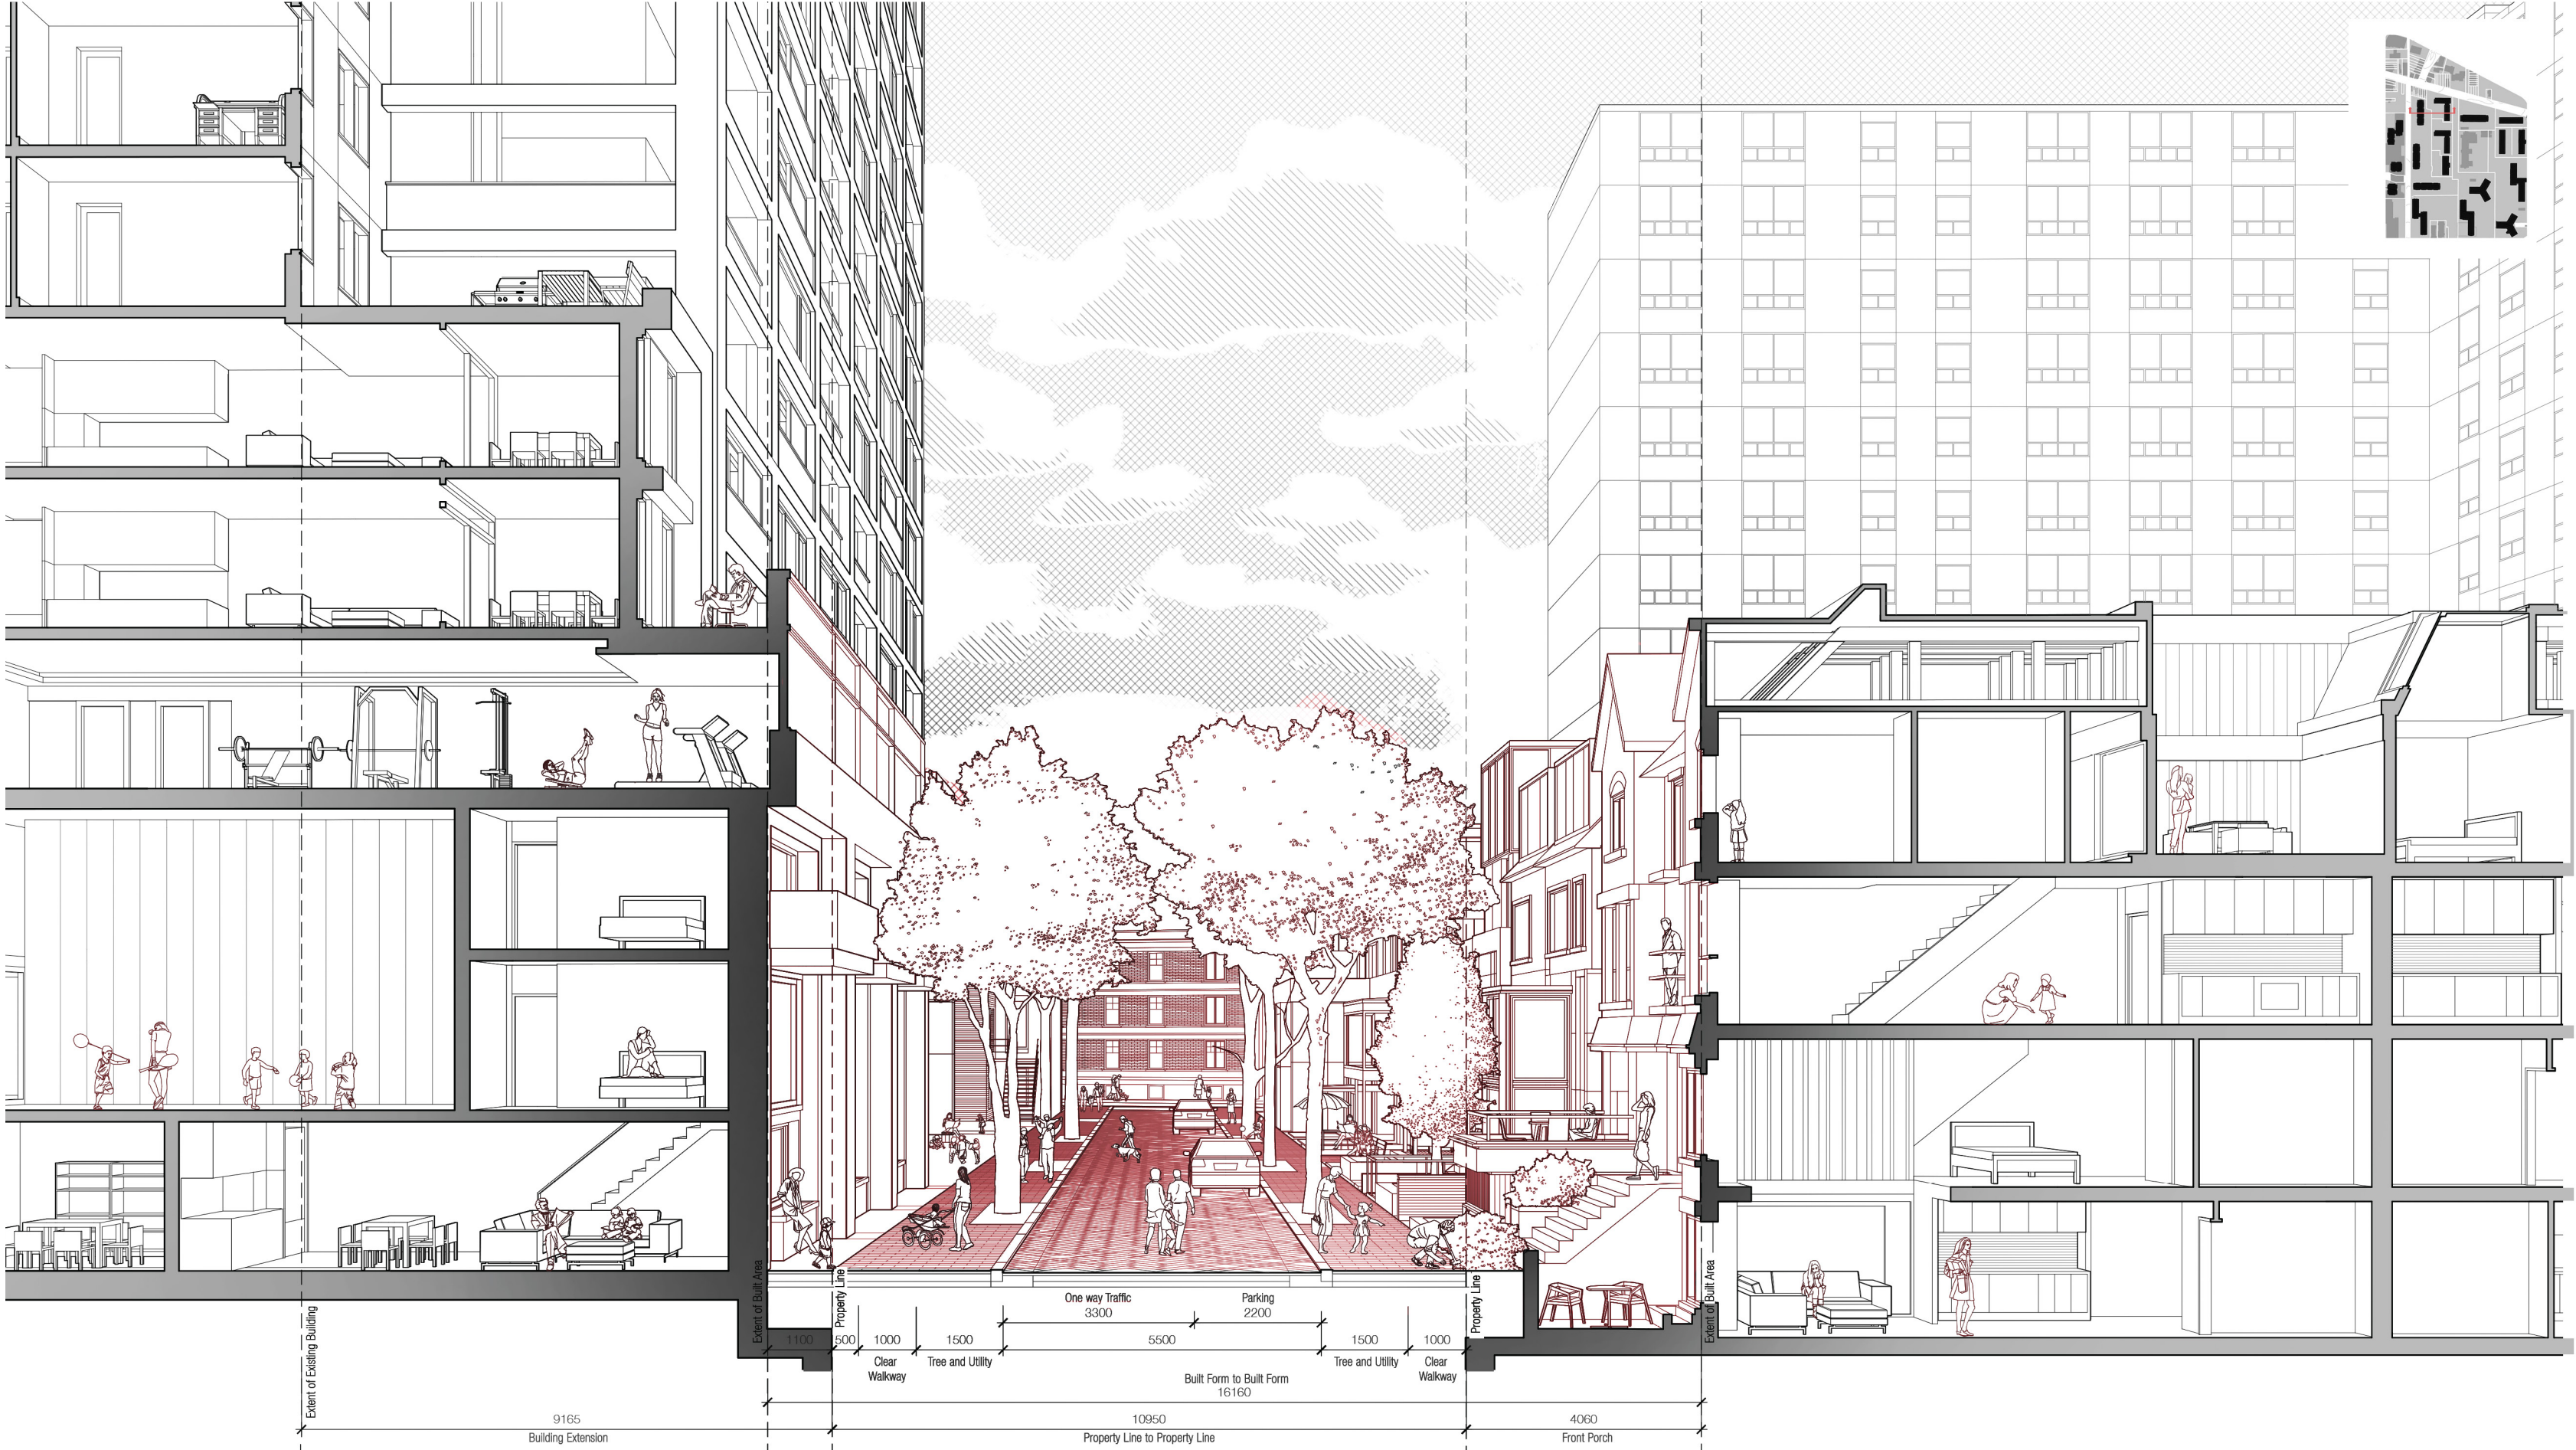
Street Section - St. James Town Lane (Residential Street)
